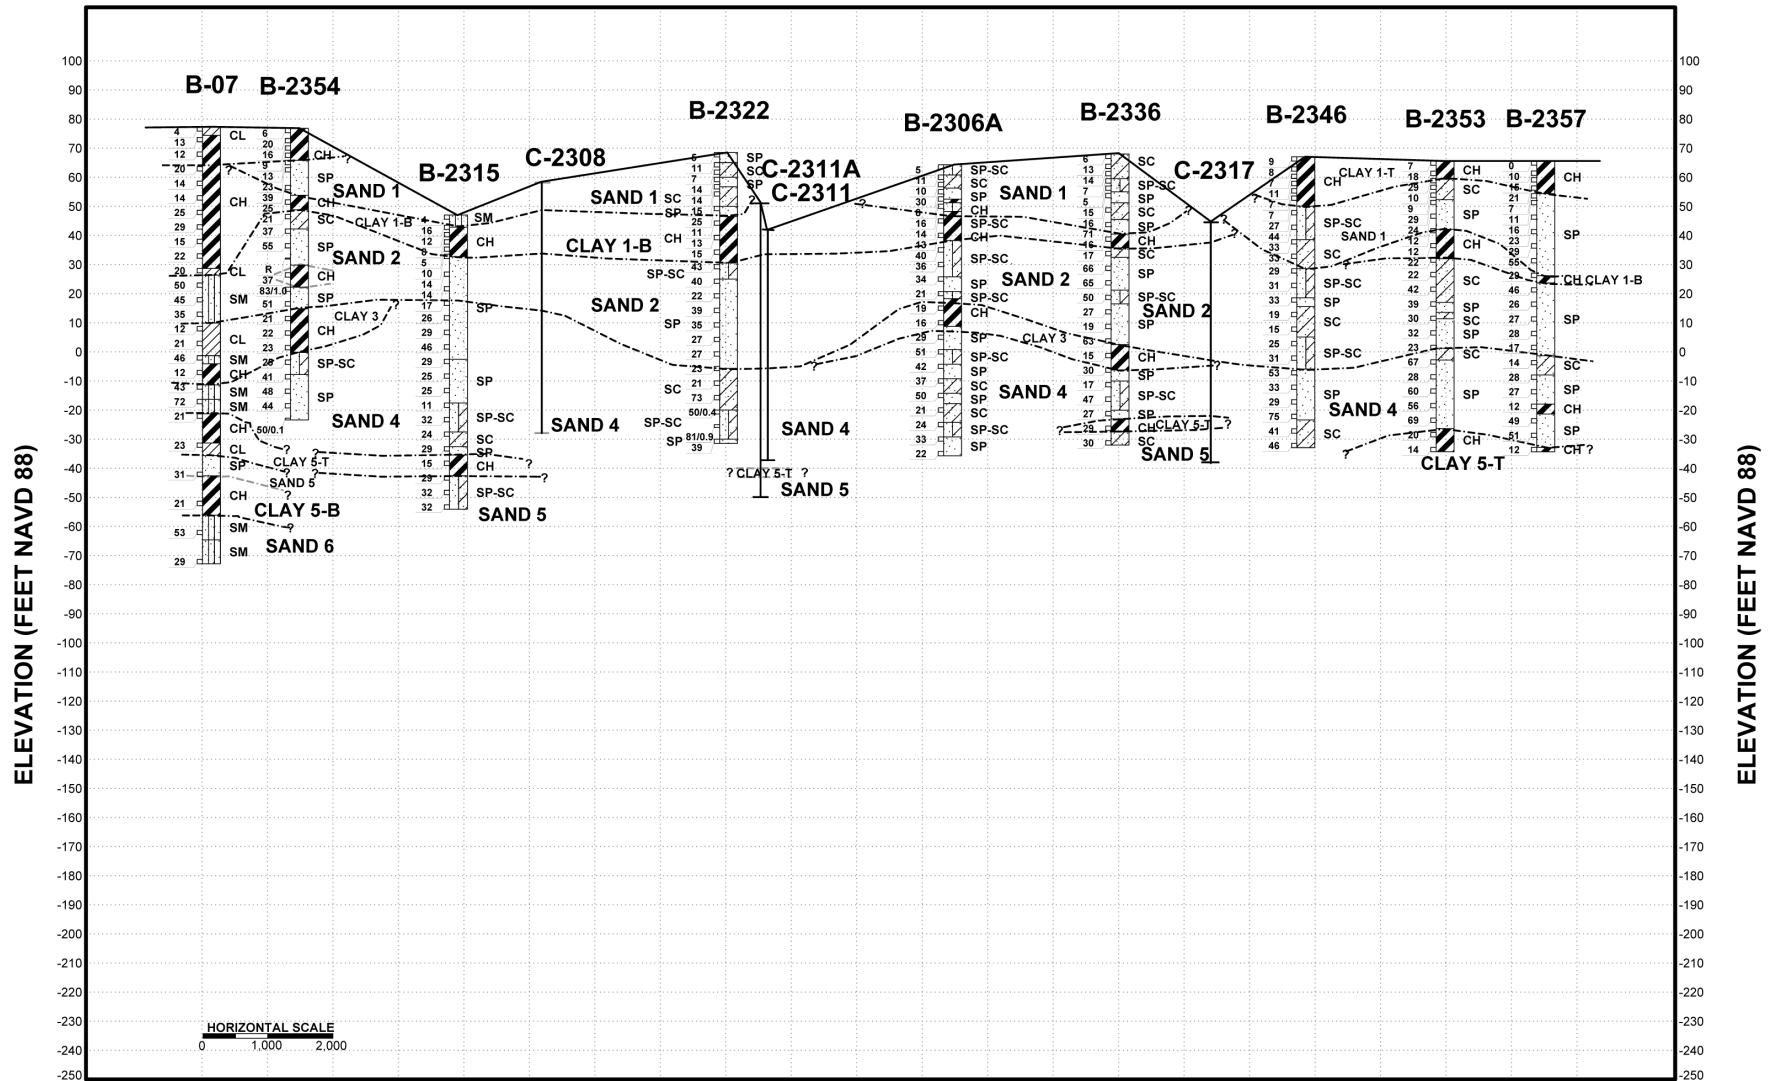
Subsurface Profile G; East Embankment Dam of GBRA Storage Water Reservoir (North-South)
